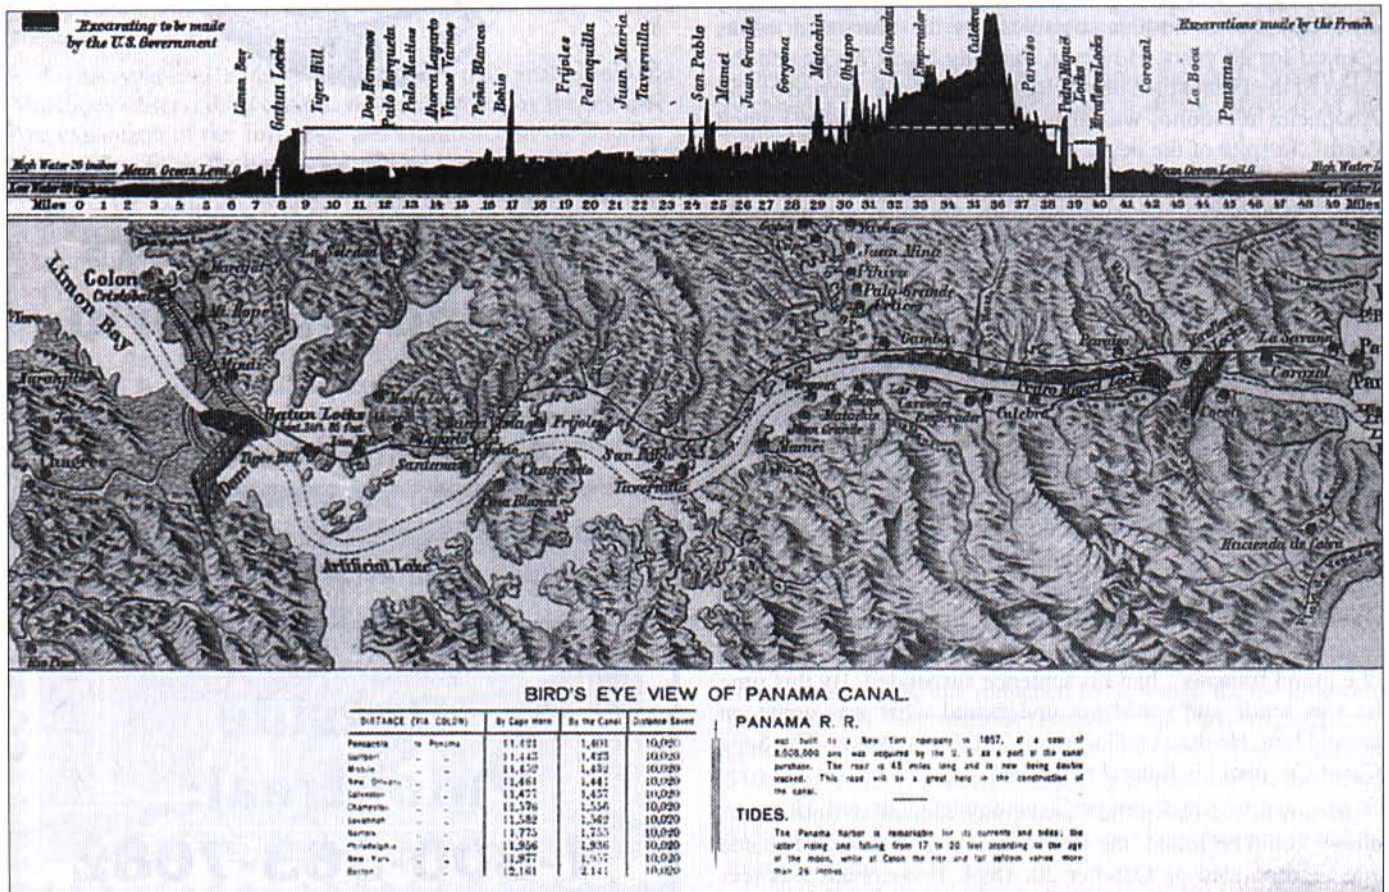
Embossed postcard shows a 'bird's-eye' view of the Canal: elevation section details the extent of excavation done by the French and by the Americans.
